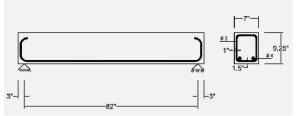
Longitudinal Section and Cross Section of R.C. Test Beam
